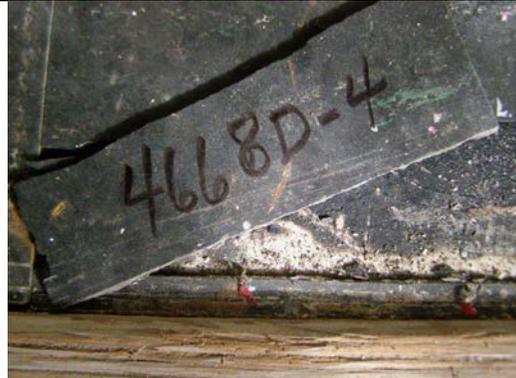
Floor Tile (4668D-4) Bedroom 1 Closet, Floor. Tile: 4% Chrysotile Asbestos Detected (PC=2.25%). Mastic: 8% Chrysotile Asbestos Detected.
